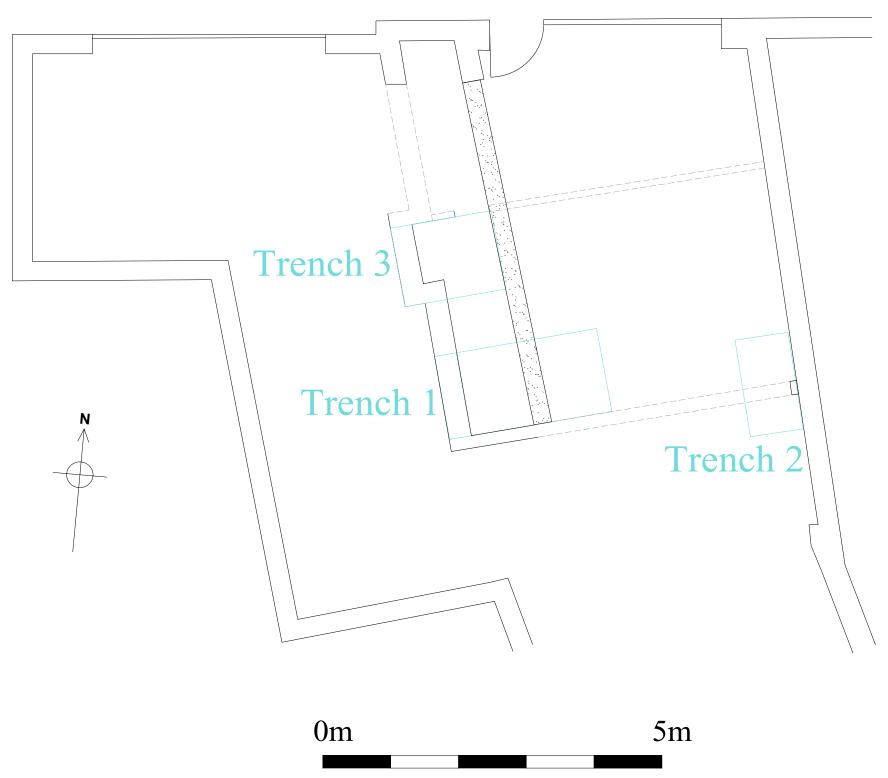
Trench Plan (Actual Walls in Black, Projected Walls in Grey and Inserted Wall Stippled).
